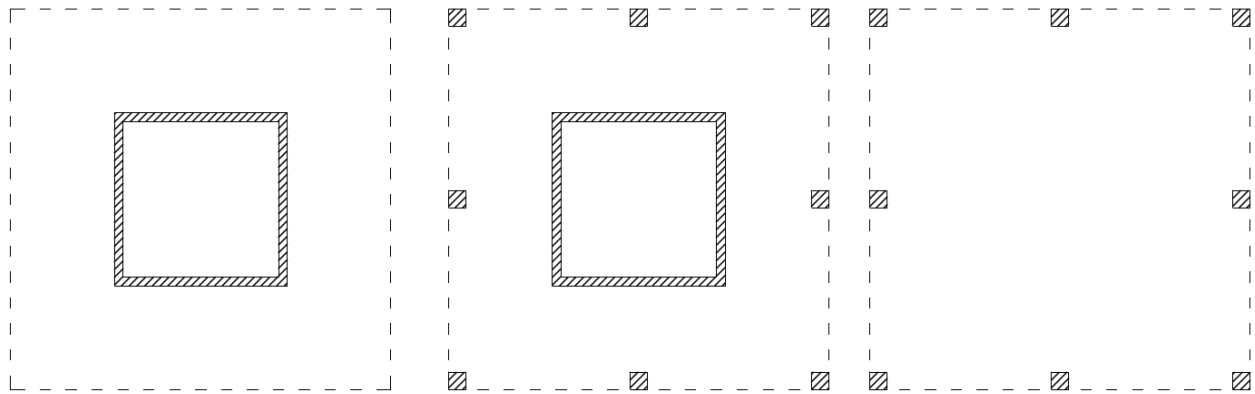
Simplified cross sections of core, core and outrigger and perimeter structural systems.
